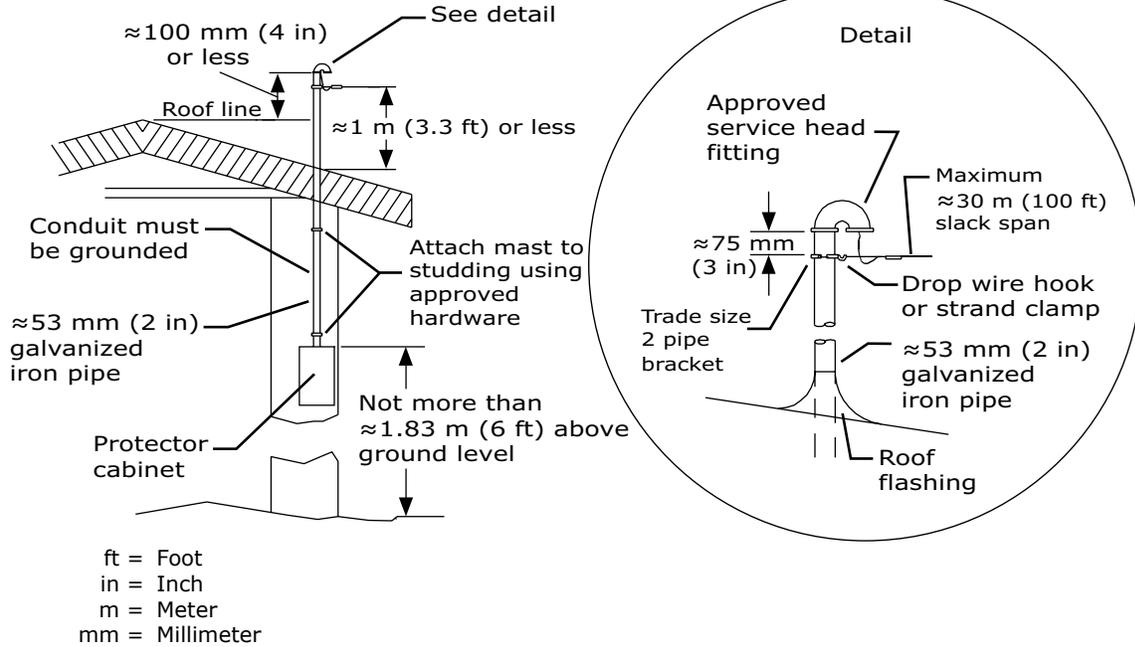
illustrates how a typical vertical conduit mast may enter the building.
